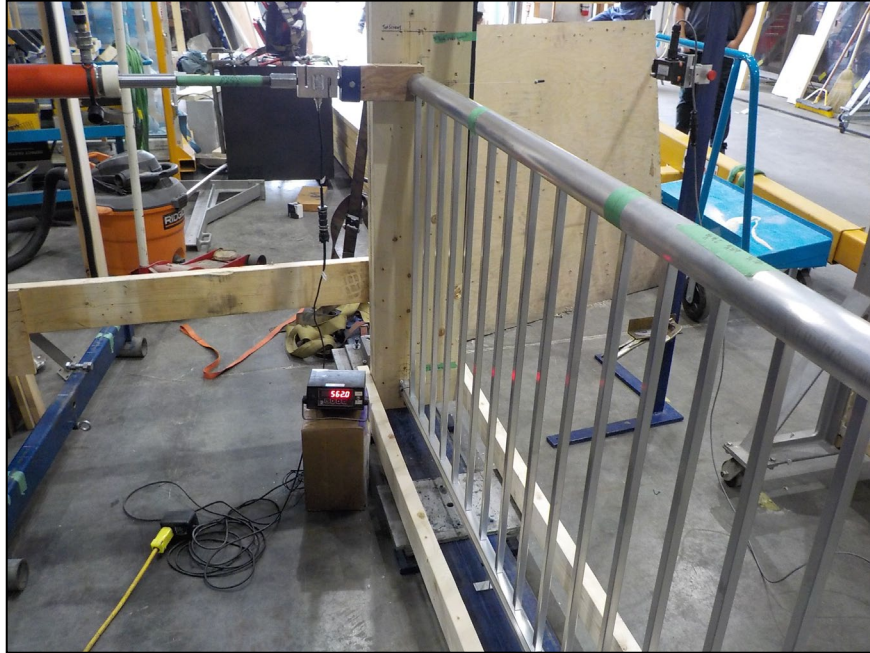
8 ft. Century Round Welded Panel – Concentrated Load (Adjacent to Wall Connection)
